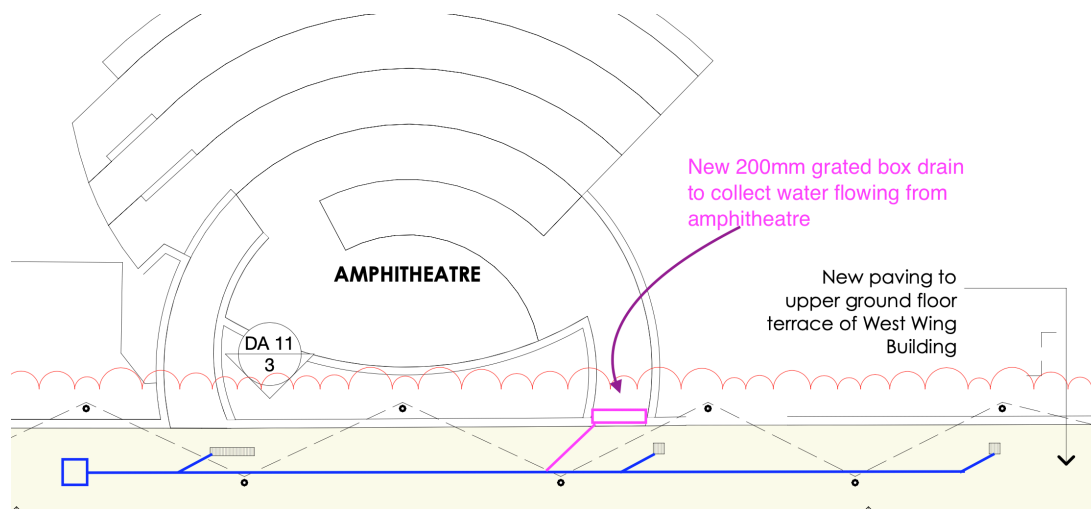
Stormwater that would have fallen on the roof will be collected in a linear drain
